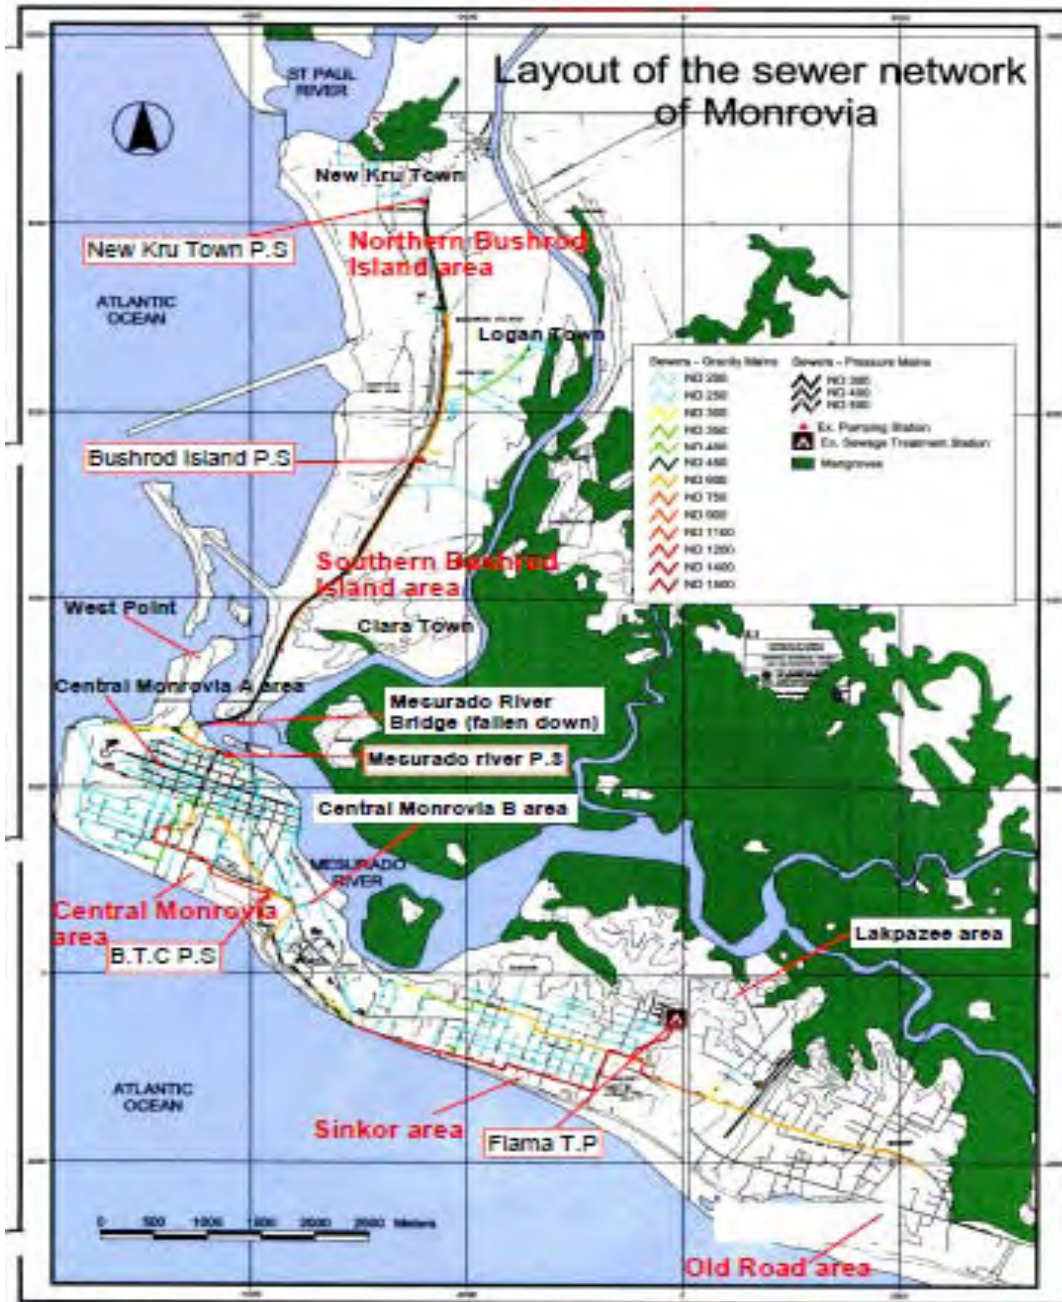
Layout of Existing Sewerage System at Bushrod Islands and Central Monrovia
